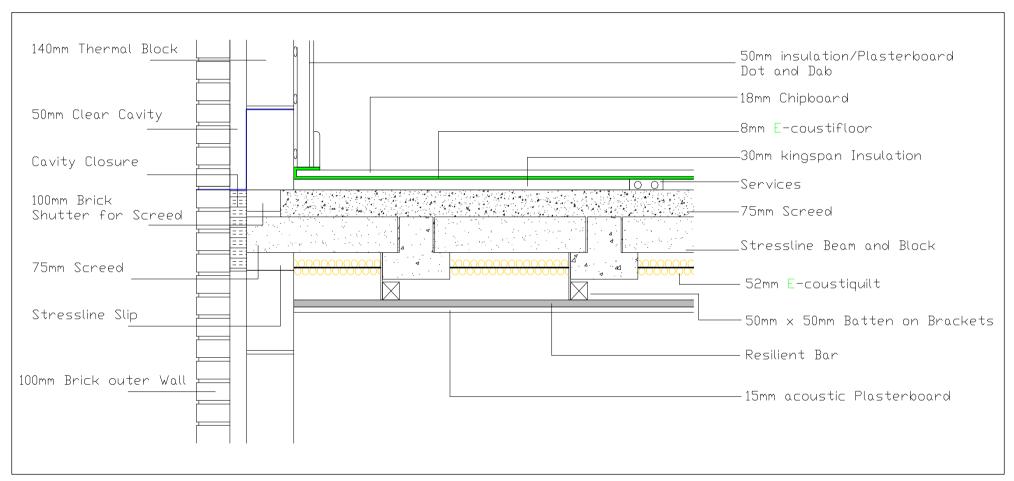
Separating floor construction between adjacent dwellings at 115 Llandudno Road, Colwyn Bay
